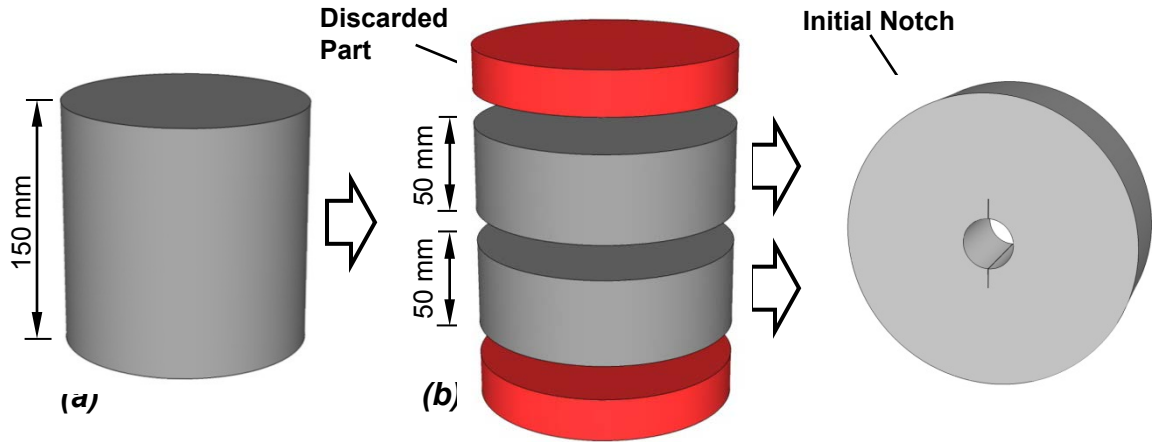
Fabrication of IRT Specimens: a) Gyratory Compacted Sample, b) Cutting the Disk-Shaped Specimens, c) Prepared IRT Specimen
